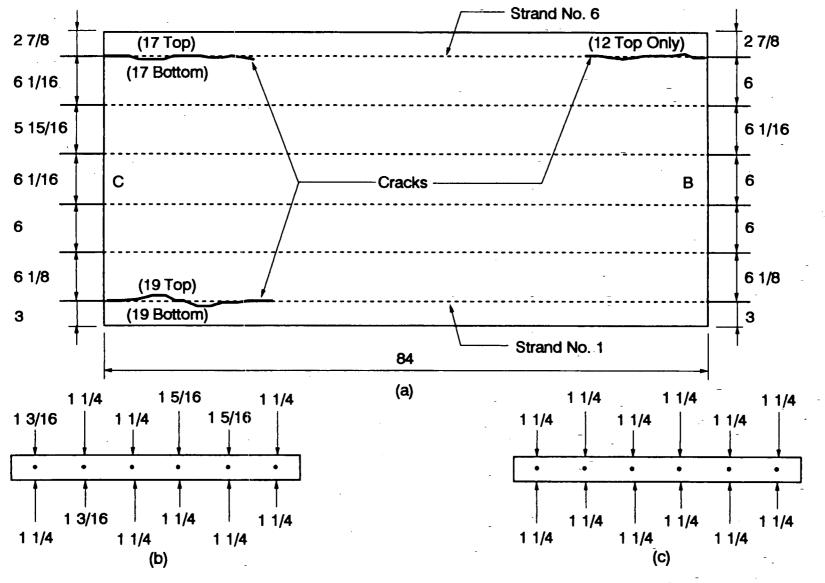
Specimen No. 5-2.5TC-2 (dimensions shown in inches):
